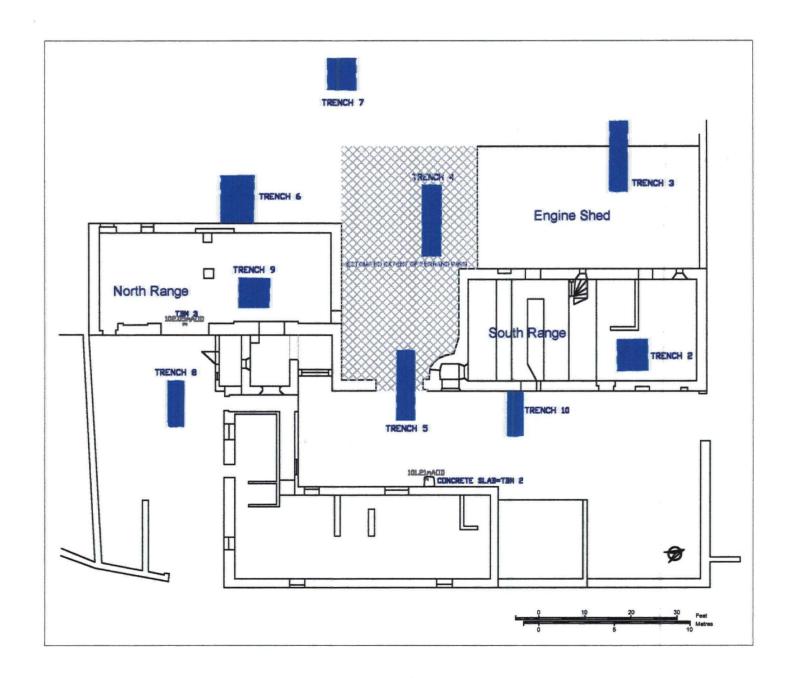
Plan of the site showing standing buildings & trench locations. Temporary Bench Marks used during excavation are also shown.
